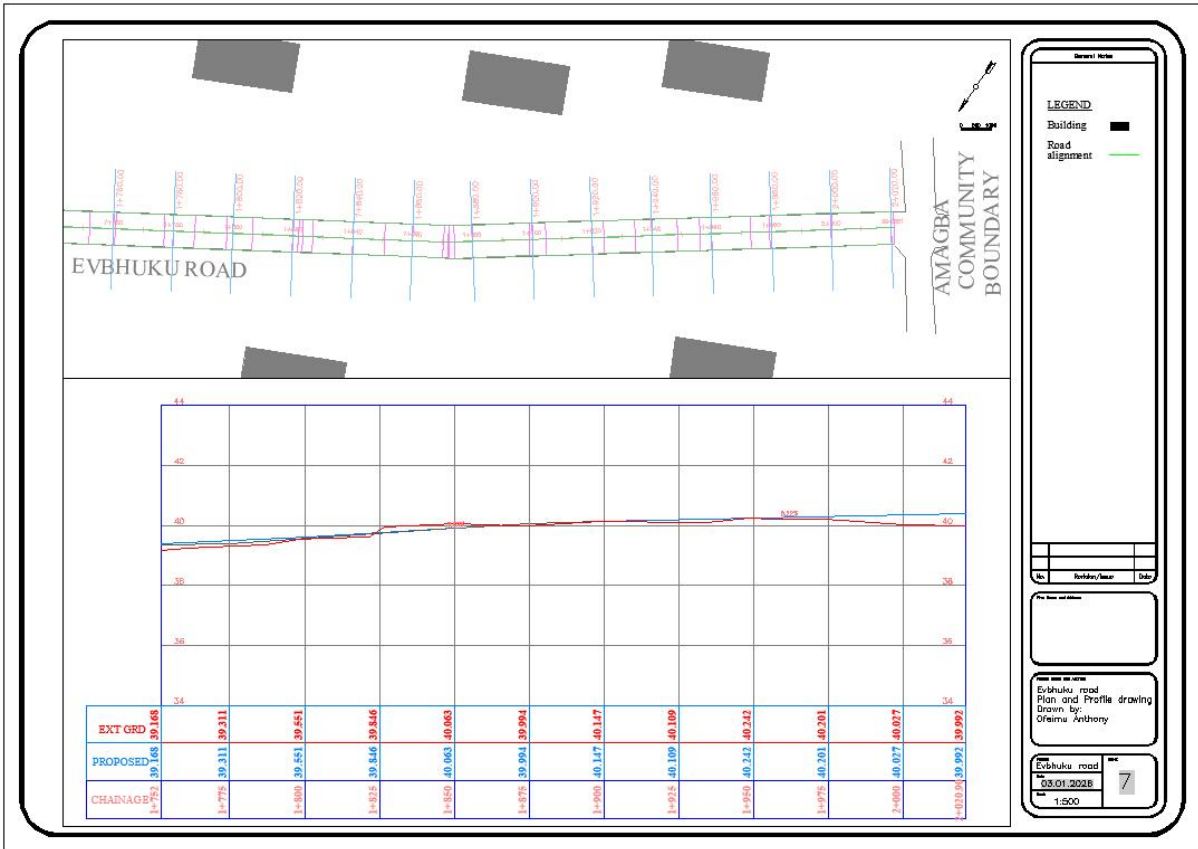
Plan and Profile Drawing (1+752 – 2+000)
